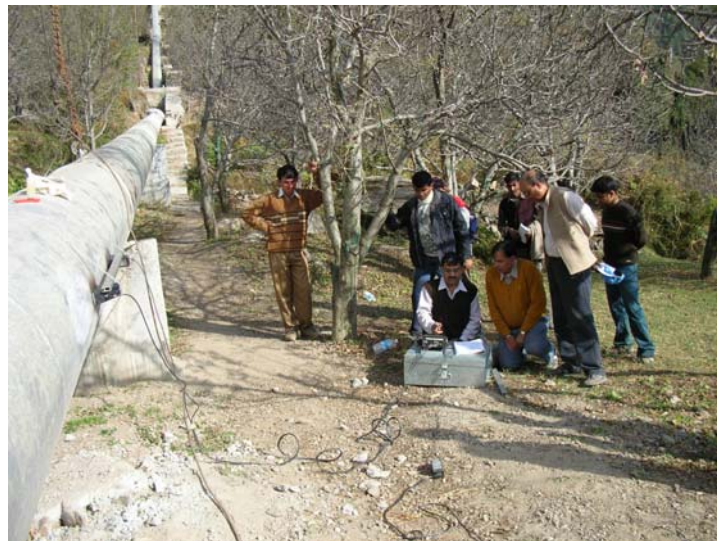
Discharge measurement with UTTF transducers clamped on penstock
